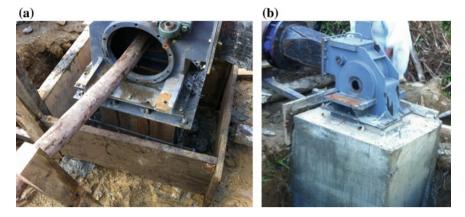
a Turbine foundation using wooden forms, b completed turbine foundation
